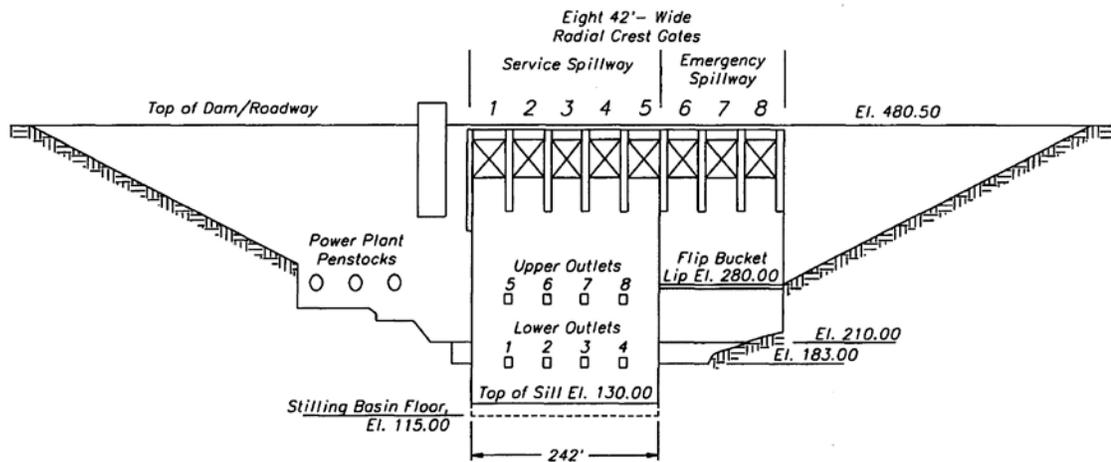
Concrete gravity section of Folsom Dam looking upstream.
